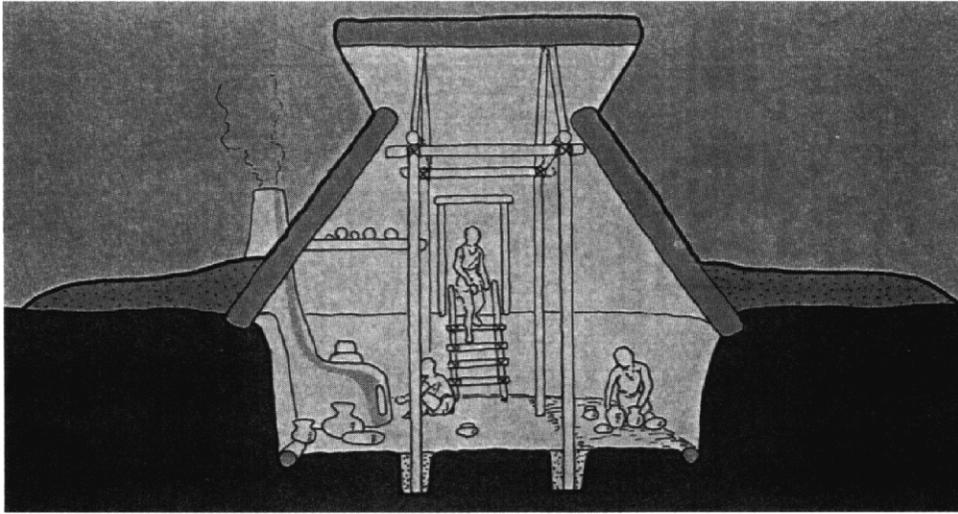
Reconstructed section of a Kofun-period pit dwelling.
